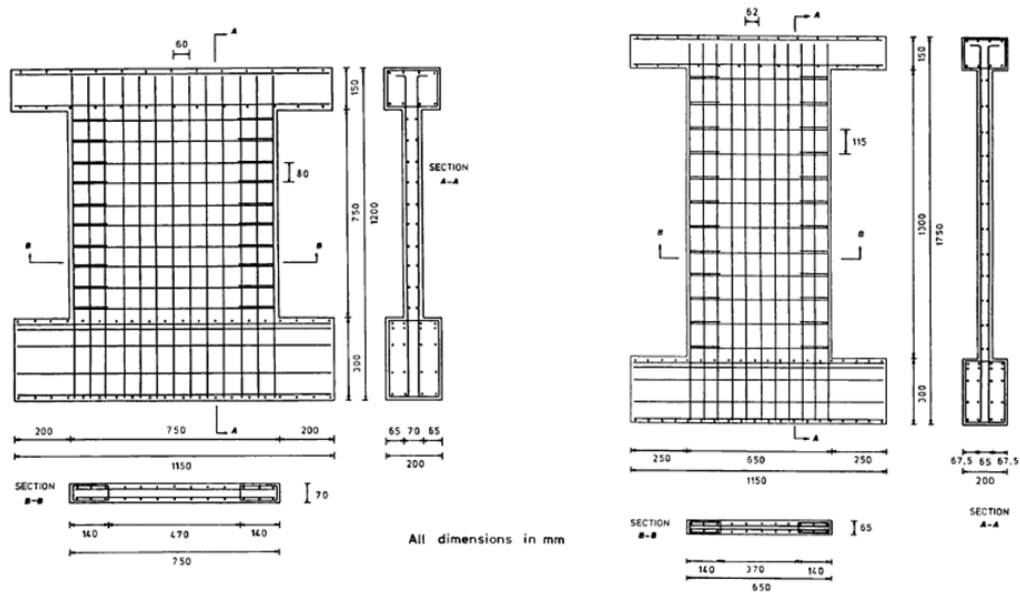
rectangular wall specimen details (Lefas et al., 1990)
